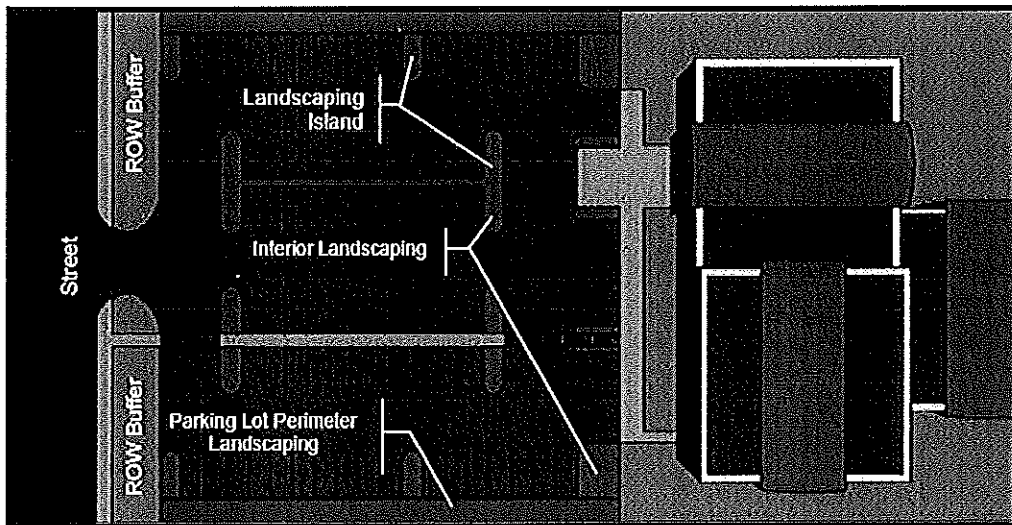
Island, Interior, and Perimeter Landscaping Plan View Illustration
